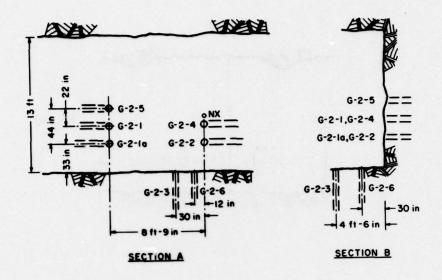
Detail plan and section of site 1 -- tunnel G - drift G.01
